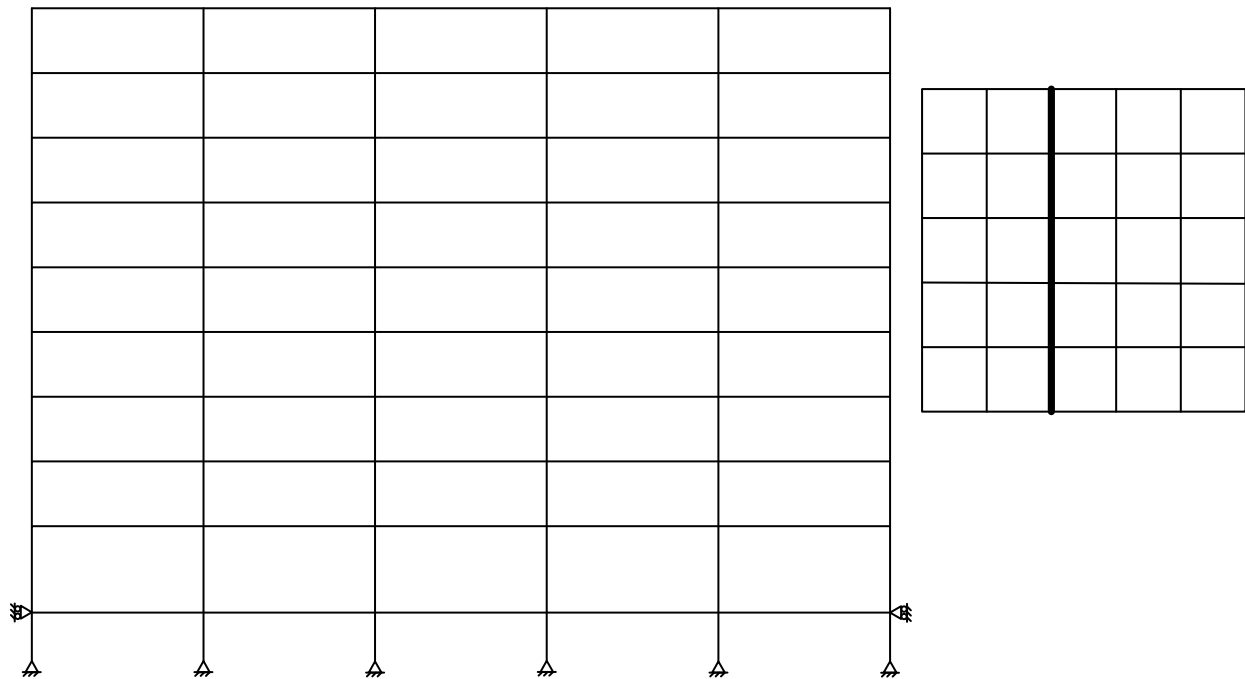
PR Archetype Model Elevation View (left) and Plan View (right)
